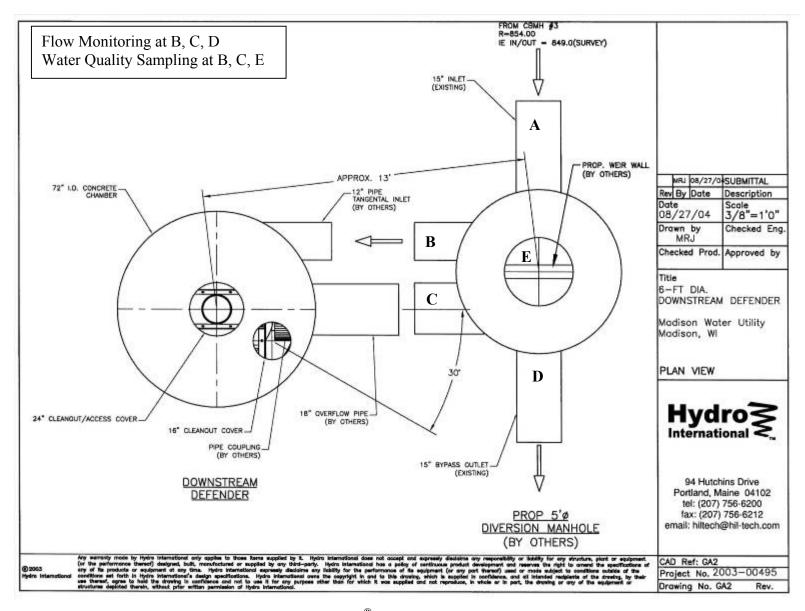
Plan view of the Downstream Defender®, Madison, WI.
